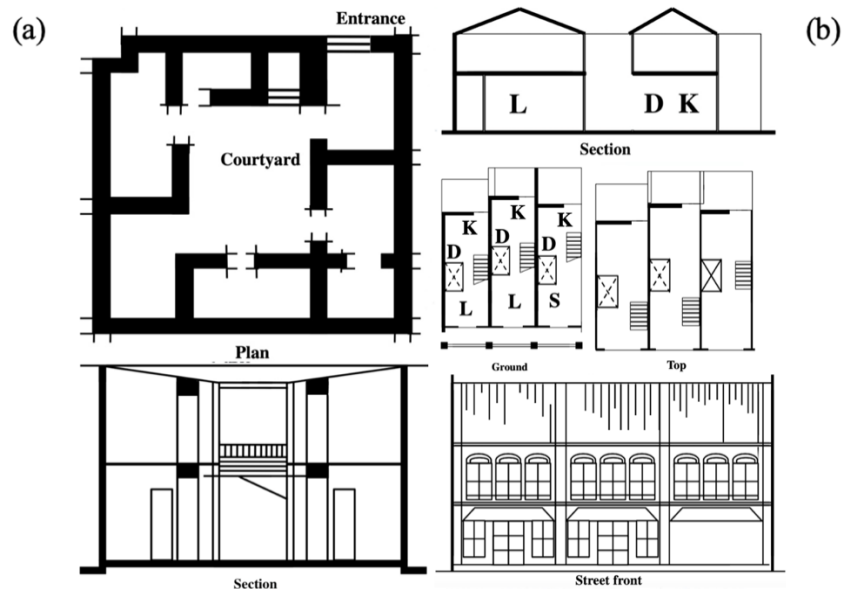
Section and plan of House of Ur, Mesopotamia (a), typical section, plan and elevation of Shop house design in Malaysia (b) [18]
